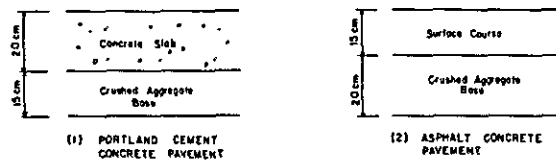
TYPICAL PAVEMENT STRUCTURES IN PANAMA
